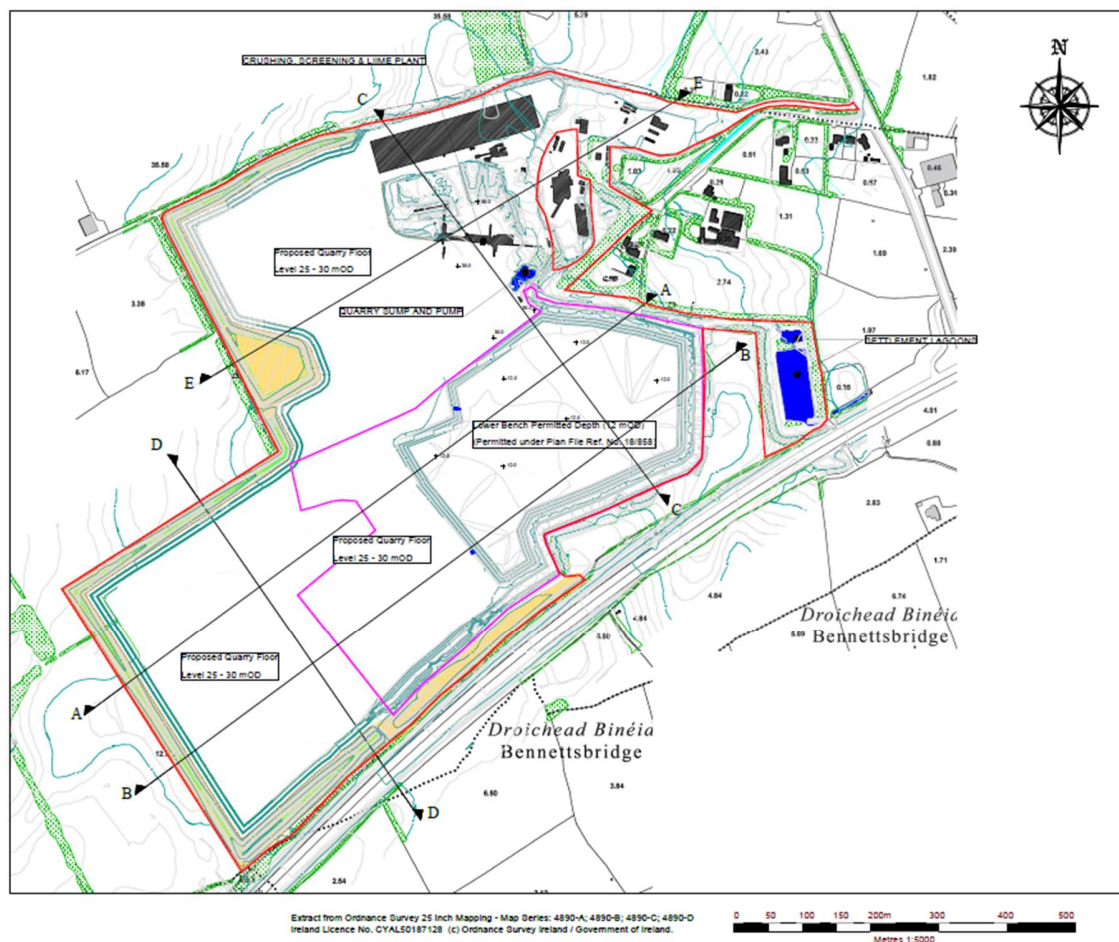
Bennettsbridge Limestone overall Site with Red Line Planning Application Area, Existing and Proposed Layout. (Refer to Quarry Consulting Figures for detail).
